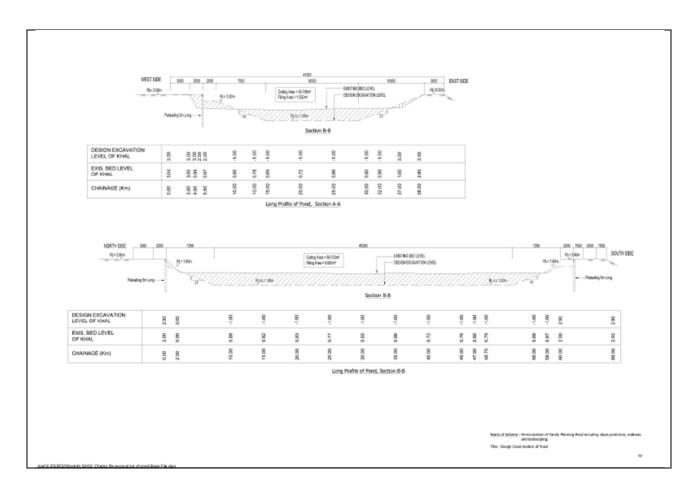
Re-excavation of Pourashava Pond including slope protection, walkway and landscaping
